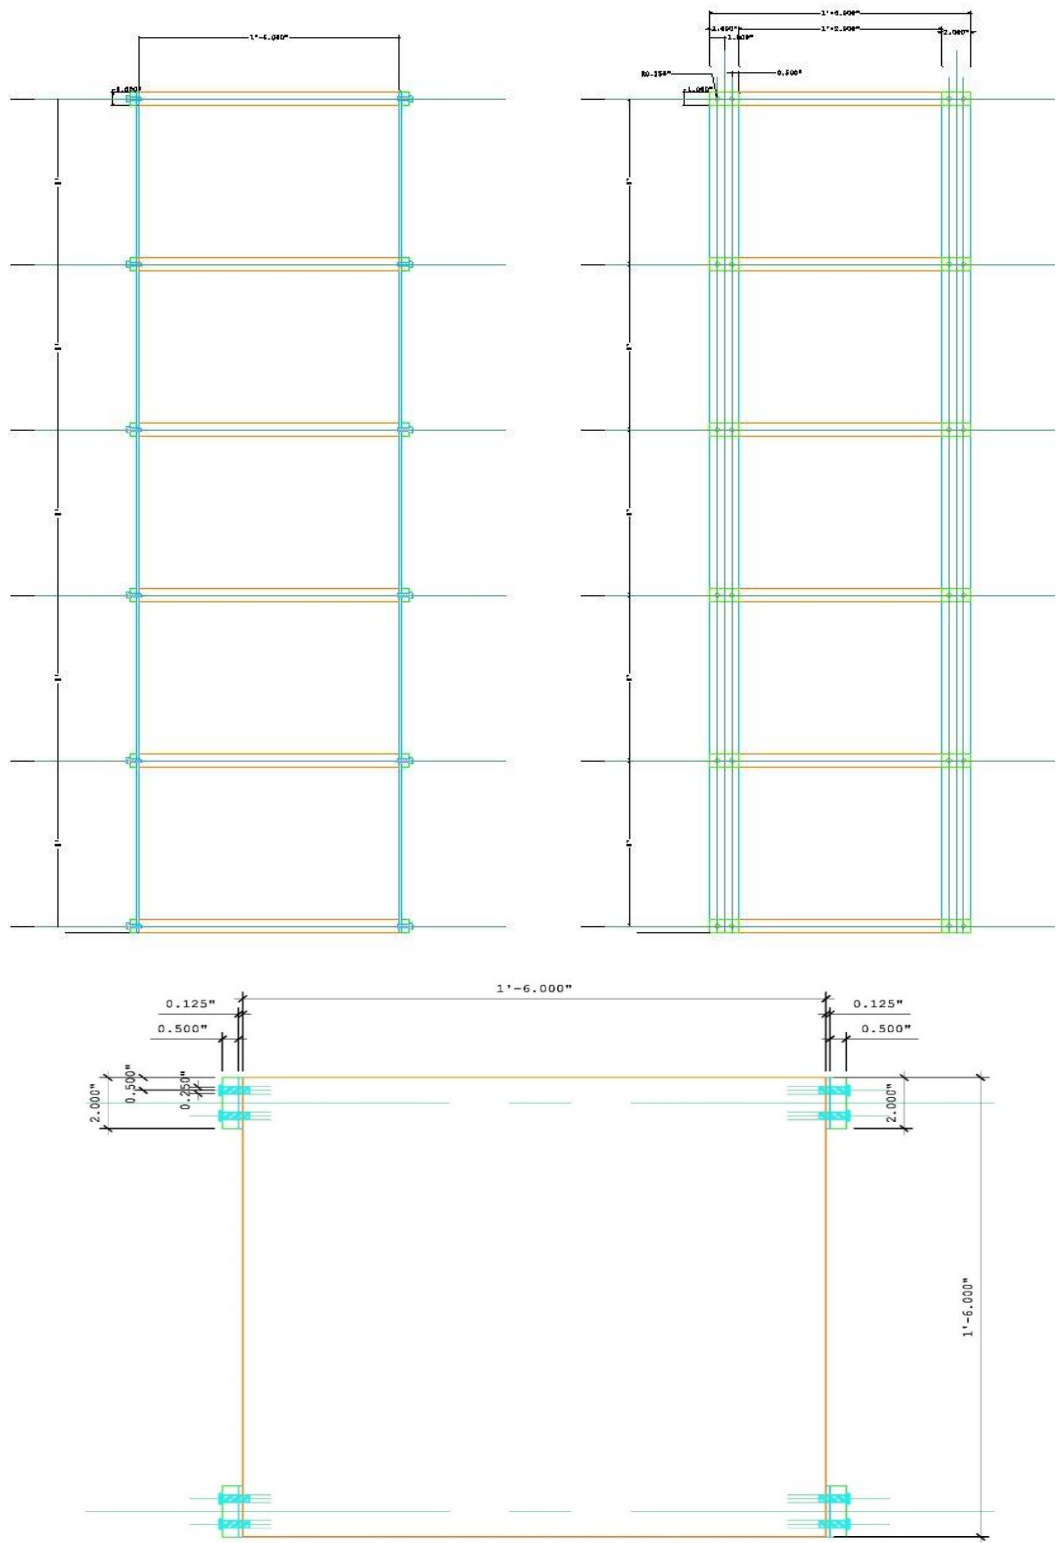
Elevation (top) and plan (bottom) and views of the five-story scaled structure
